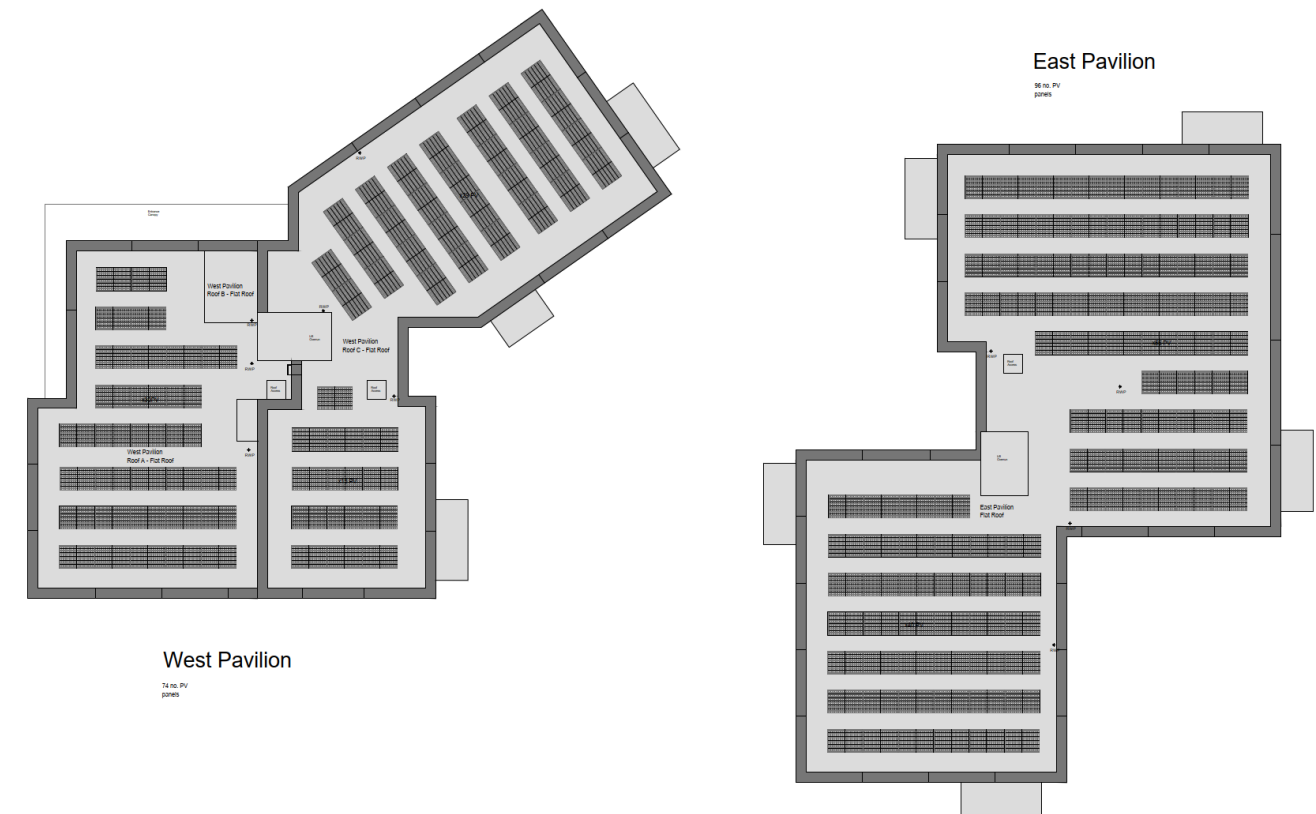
Proposed PV Array on the roof at Portslade Community Centre
